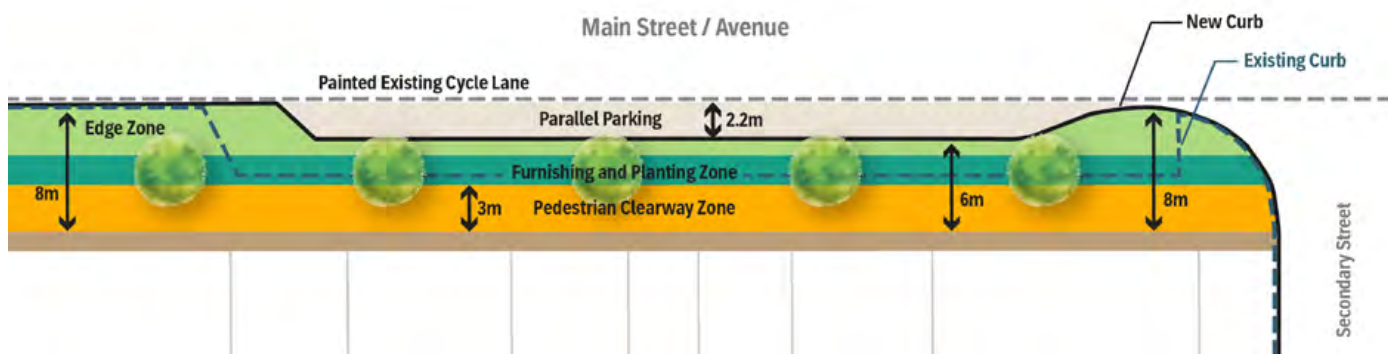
Demonstration plan for an 8-metre Sidewalk zone in the Long Branch Station Area that modifies existing angular parking. Refer to Appendix E for additional demonstrations.
